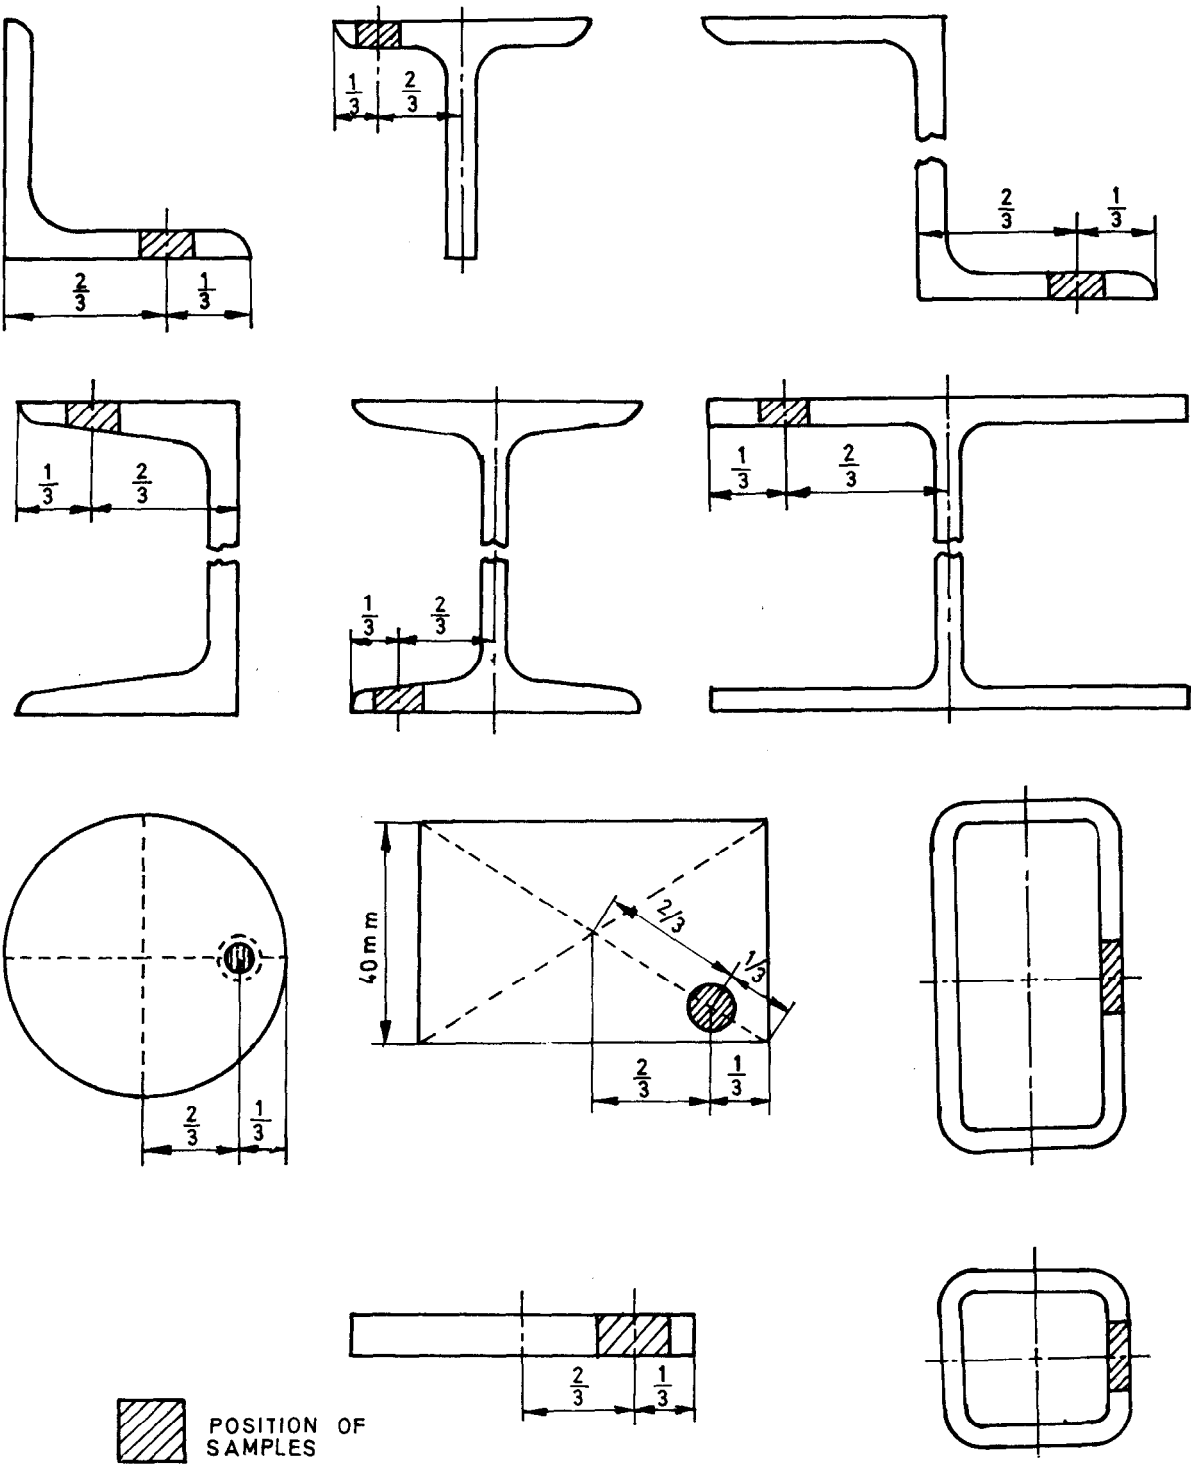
STRUCTURAL STEEL SECTIONS, POSITION AND ORIENTATION OF SAMPLES
